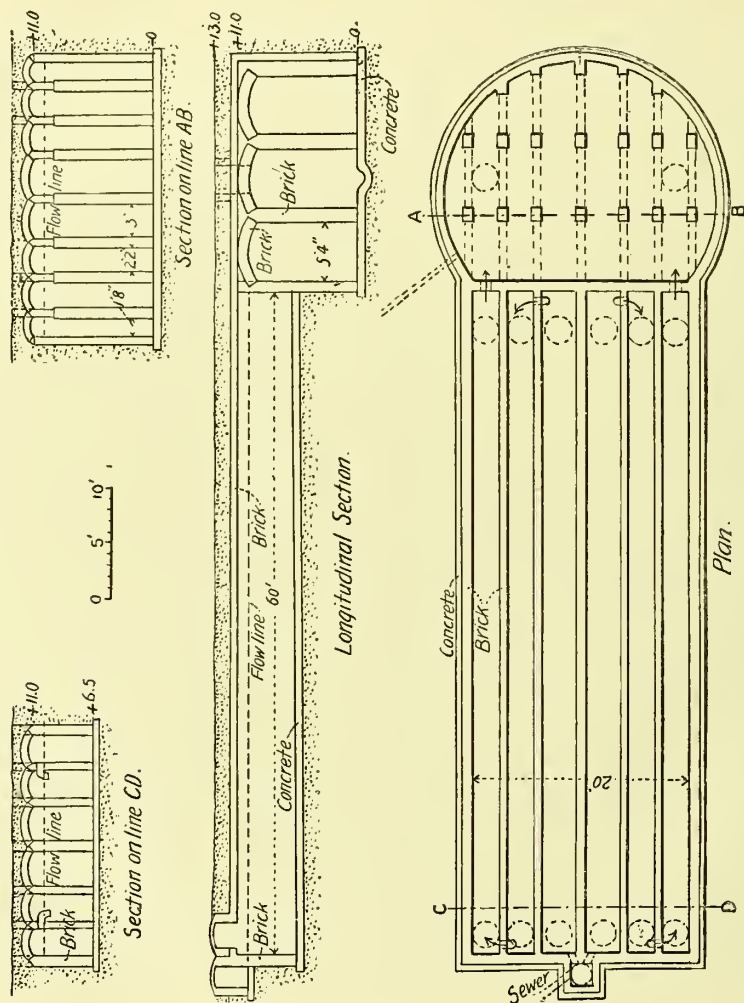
PLAN AND SECTIONS OF RECEIVING AND SETTLING TANK, LAWRENCEVILLE, NEW JERSEY, SCHOOL.
